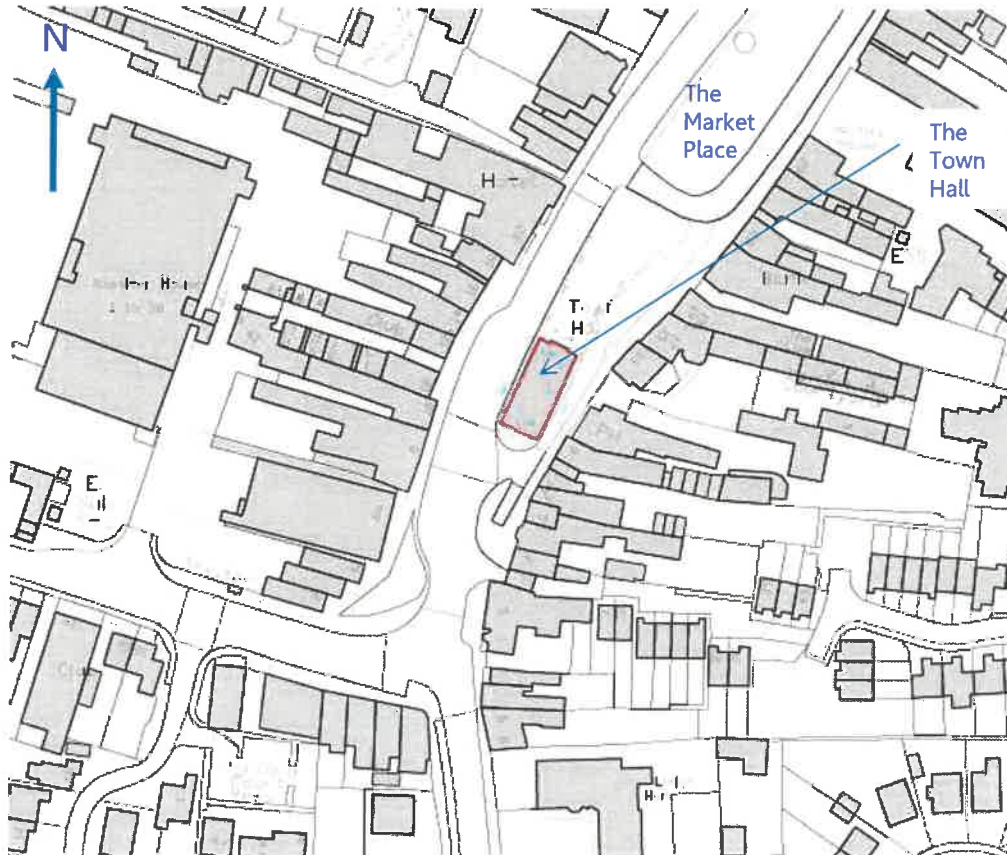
Site plan – extract from drg 1054 T1000 courtesy of Haverstock
